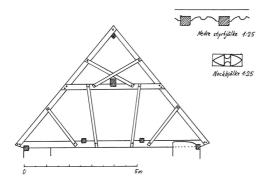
Section of the roofing above the nave of Bälaryd with three decorated steering plates and ridge purlin. Drawing by R. Gullbrandsson.
